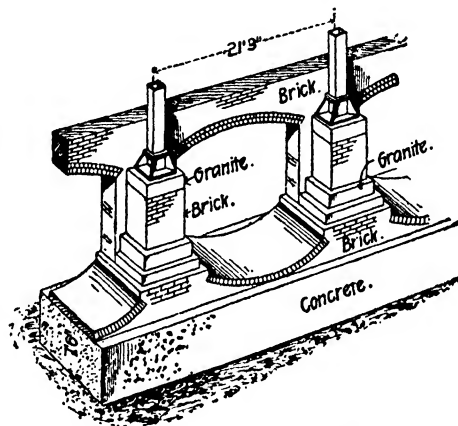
Footing of Inverted Masonry Arch, Drexel Building, Philadelphia, Pa. published in 1872. In its original and simplest form the independent footing consists of a wide concrete or masonry footing with its maximum area at the base and stepped off to decrease in horizontal area toward the top, the latter being of sufficient size to form a seat for the wall or column base.
